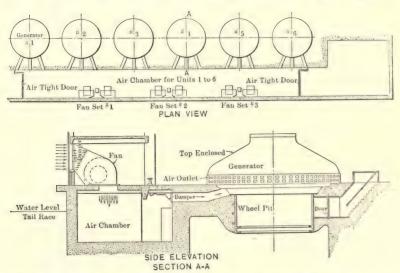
Plan and Sectional Elevation of Ventilating System for Large Horizontal Slow-speed Generators.
